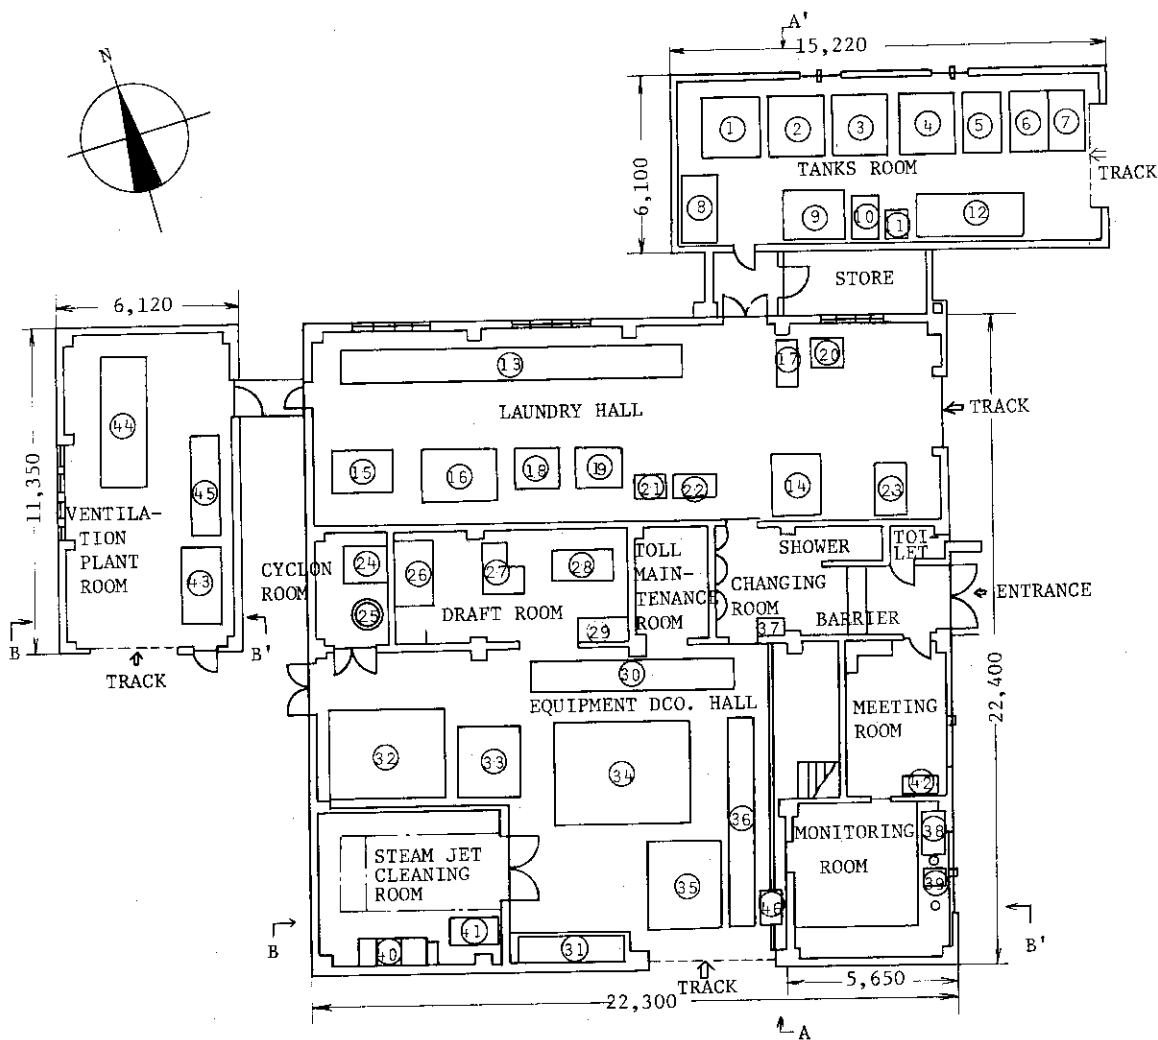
Floor plan and equipment layout of decontamination facility
